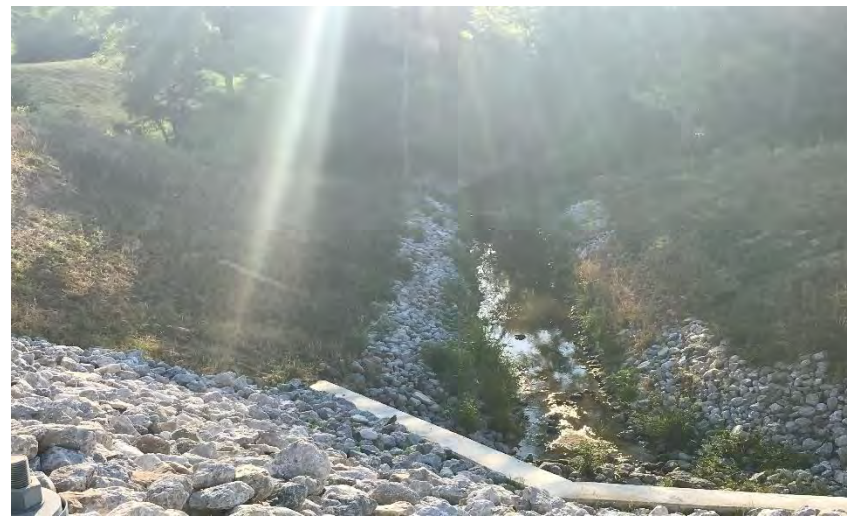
Looking east (downstream) towards the outlet of UNT 1 on the east side of the Hillegas Road and West Coliseum Blvd. intersection.
